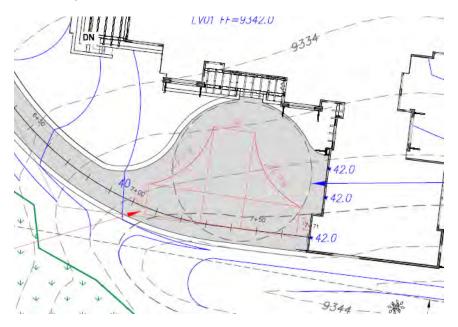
Driveway Plan - TFPD Standard Hammerhead Turn-Around
